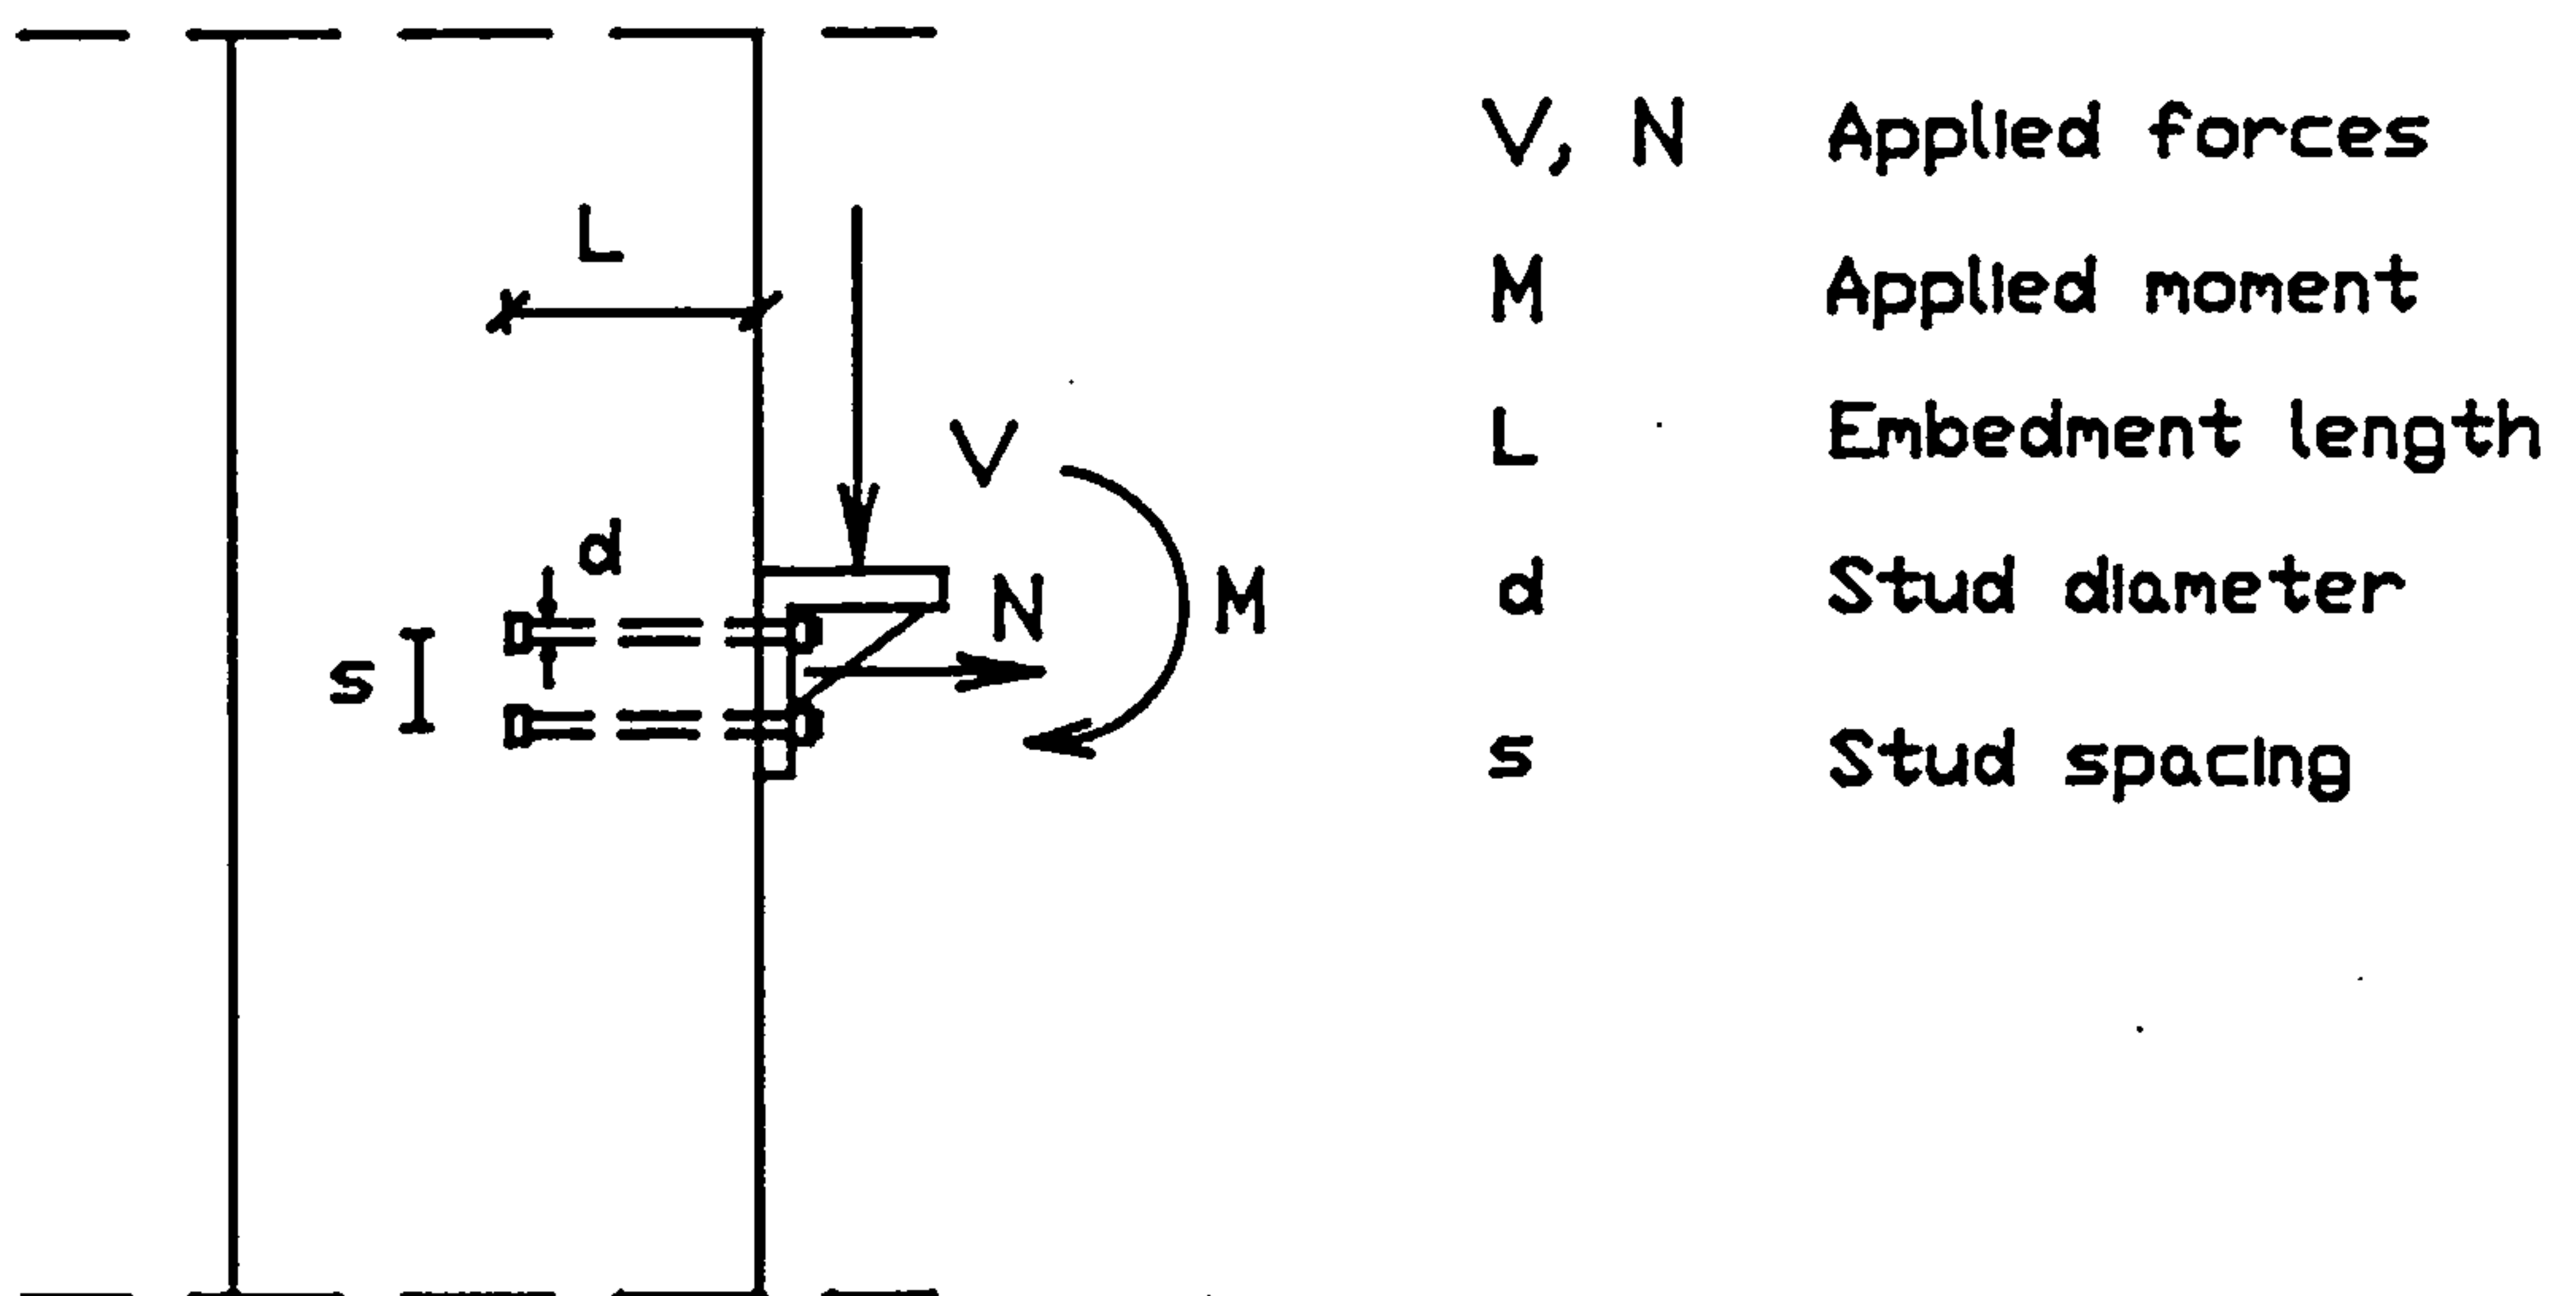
TYPICAL DESIGN ELEMENTS FOR A HEADED STUDS JOINT.
